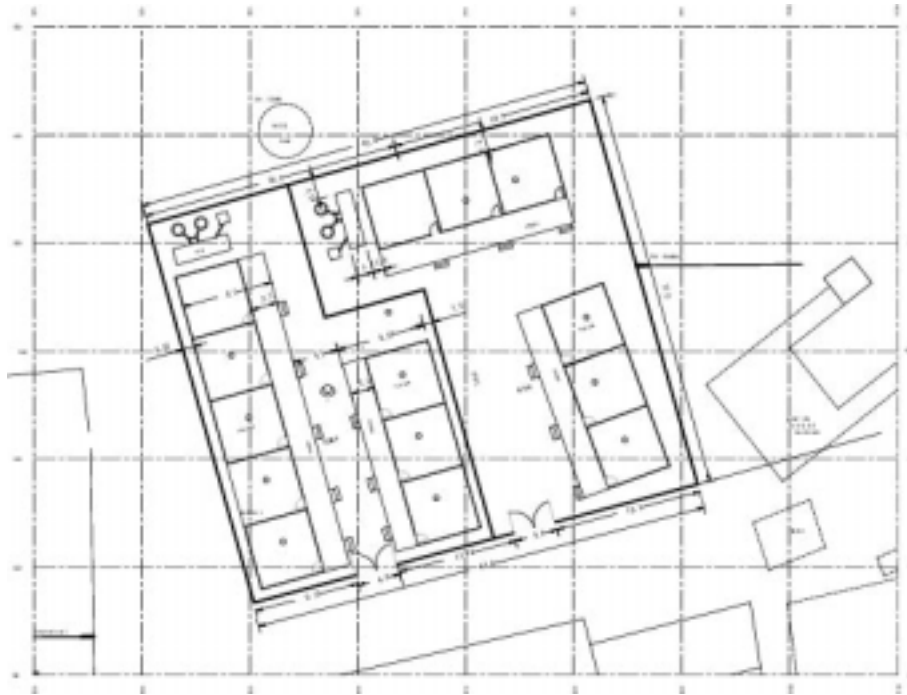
Revised Layout Plan – Bhadreshwar (Boys) & (Girls) Primary School
